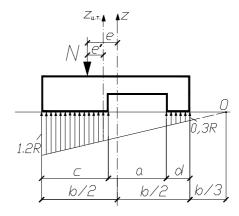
Eccentrically loaded strip foundations of retaining walls with asymmetrical cut-outs on the bottom
